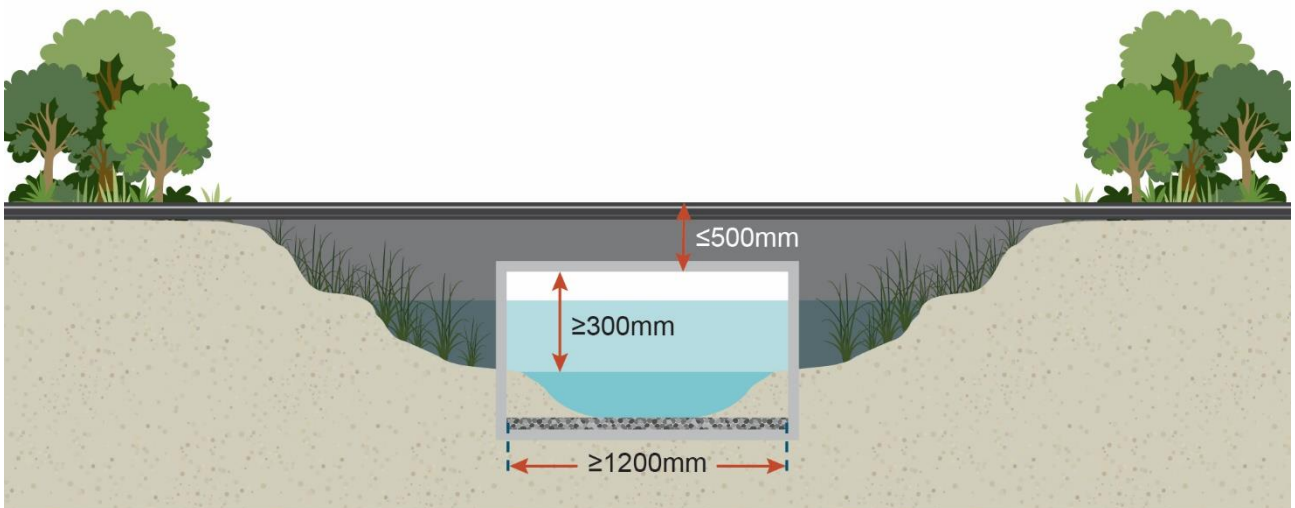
Culvert crossing (cross-section of waterway) – *green* waterway
